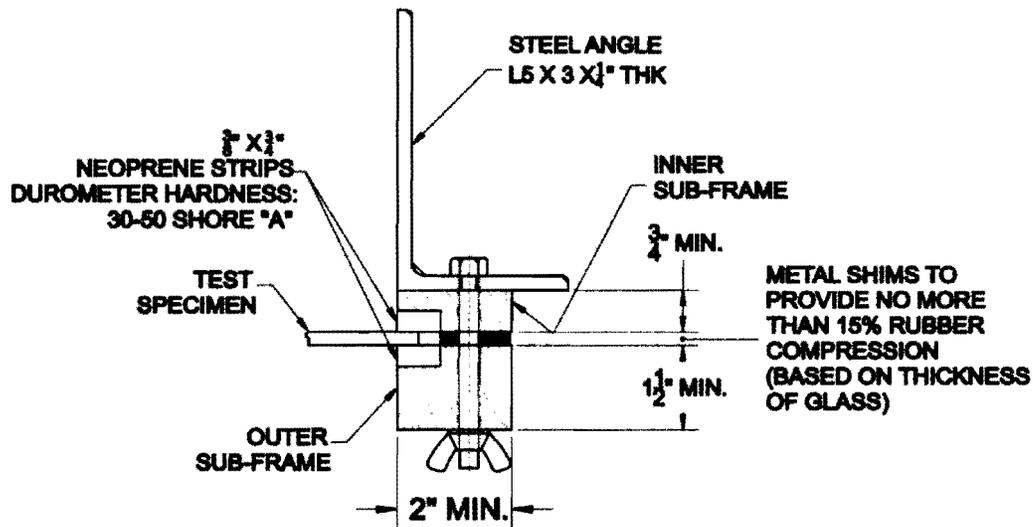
Detail of Section A-A PROPERLY Clamped Test Specimen (>1/8 inch (3 mm))
